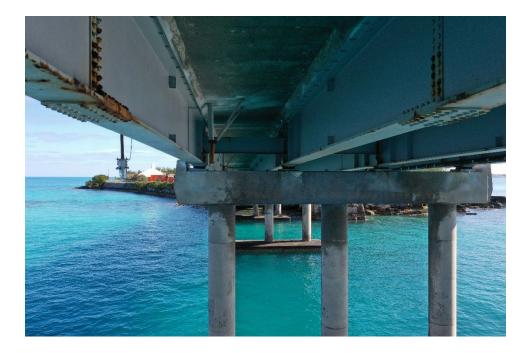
Bearings 15 and 16 showing cracking of the concrete plinths
